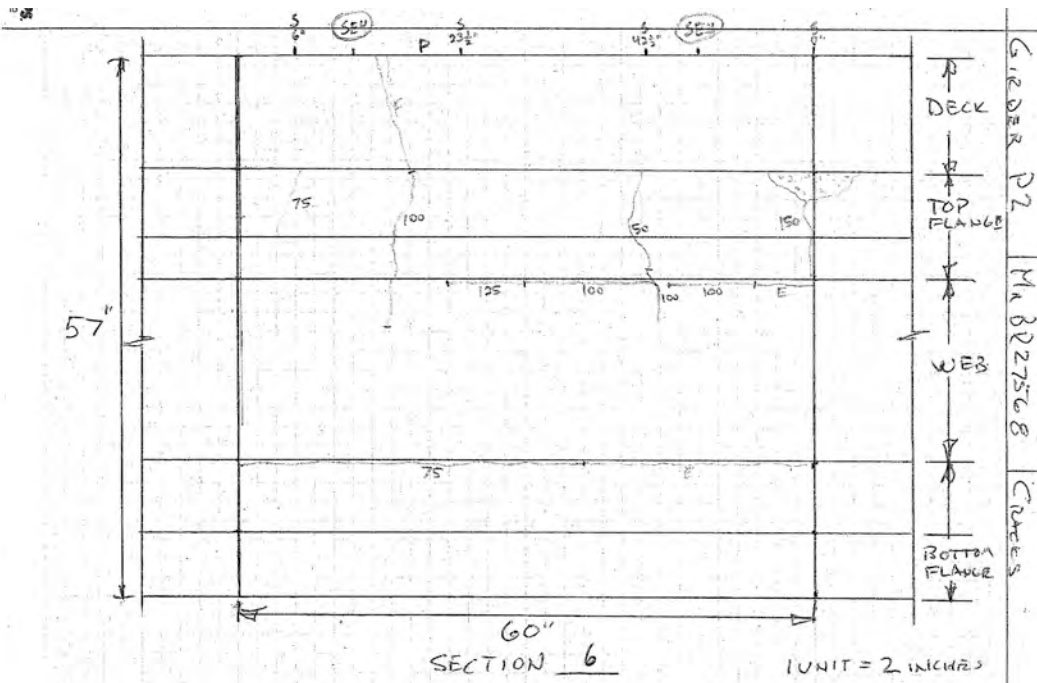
Girder P2 crack pattern – Section 6
